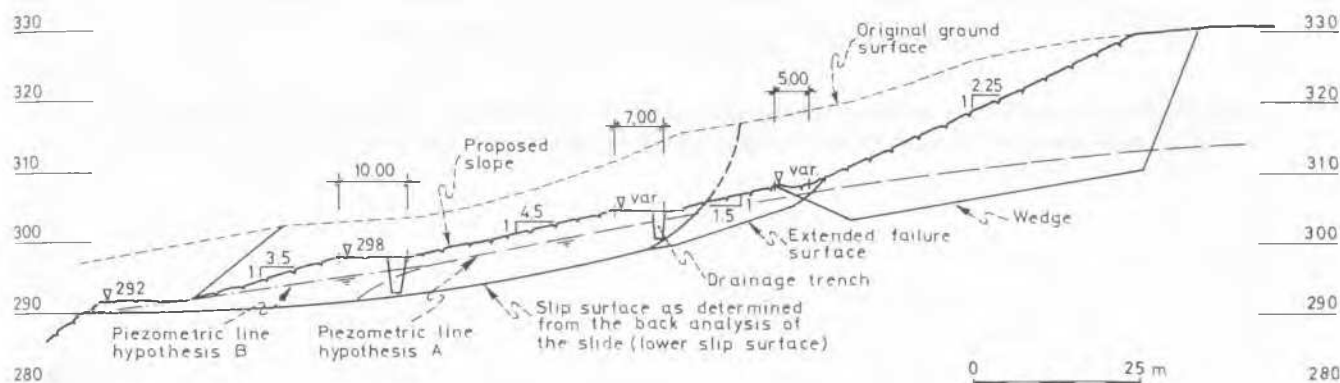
Intake - Slope Failure in the Right Bank - New Slope Profile and Remedial Measures
